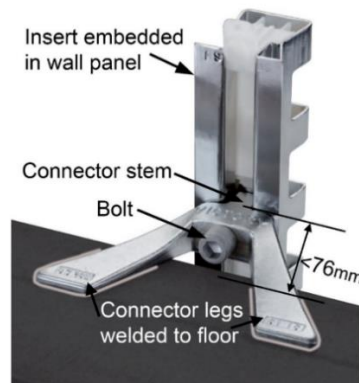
Slotted wall-to-floor V connector (Watkins, 2017)
